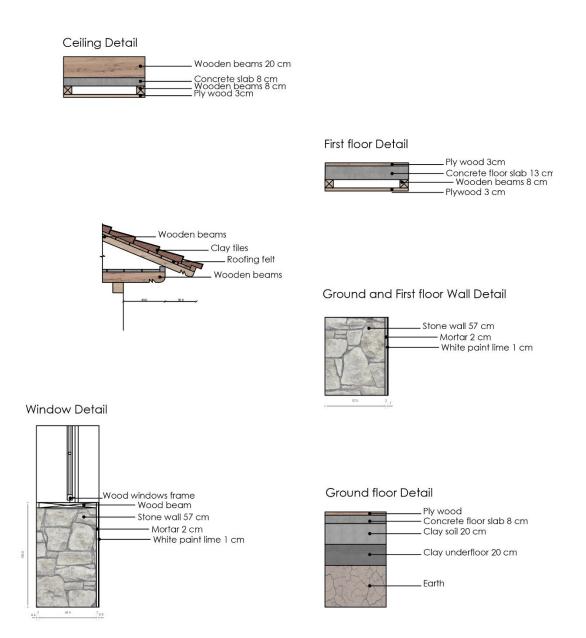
Beqiri, A. (2024) Lluke Zanati House Construction Details
